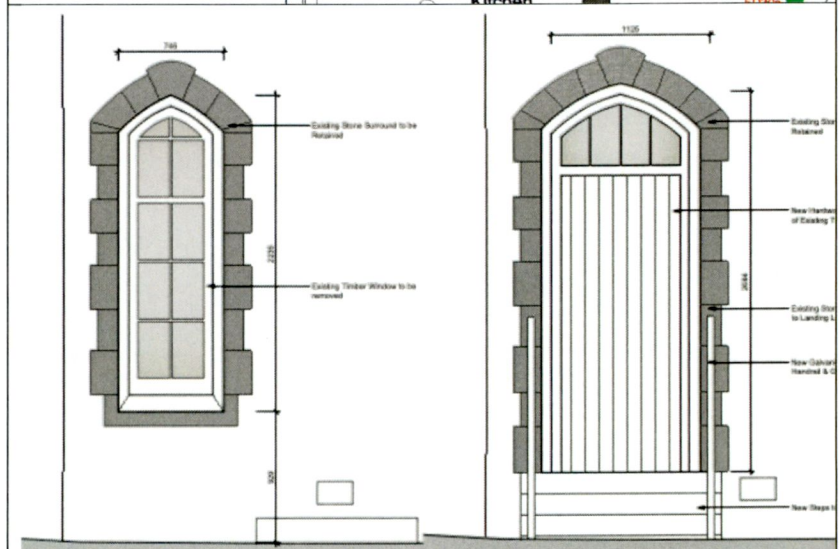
Existing window indicated at left and proposed new door to open into courtyard at GW 22 (beside '04' on plan at Fig) – new sheeetd timber door and glazed fanlight with dressed stone surround to be retained and modified to form new door opening. New stone steps also to the courtyard.
